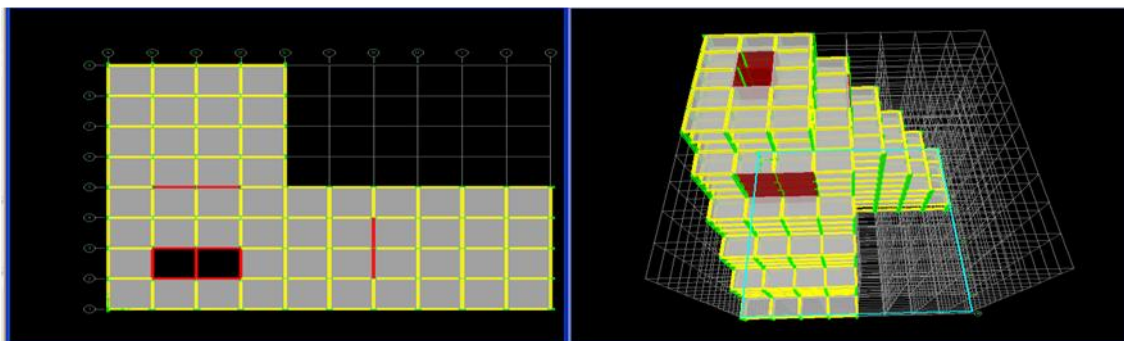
3D View of Special Moment Resisting Frame with Shear Wall Building
